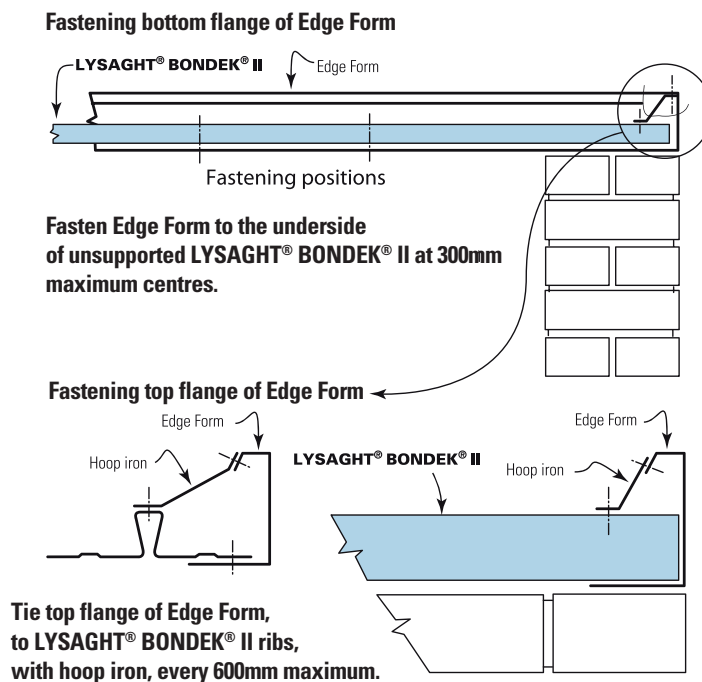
Typical fastening of EDGE FORM to LYSAGHT® BONDEK® II
